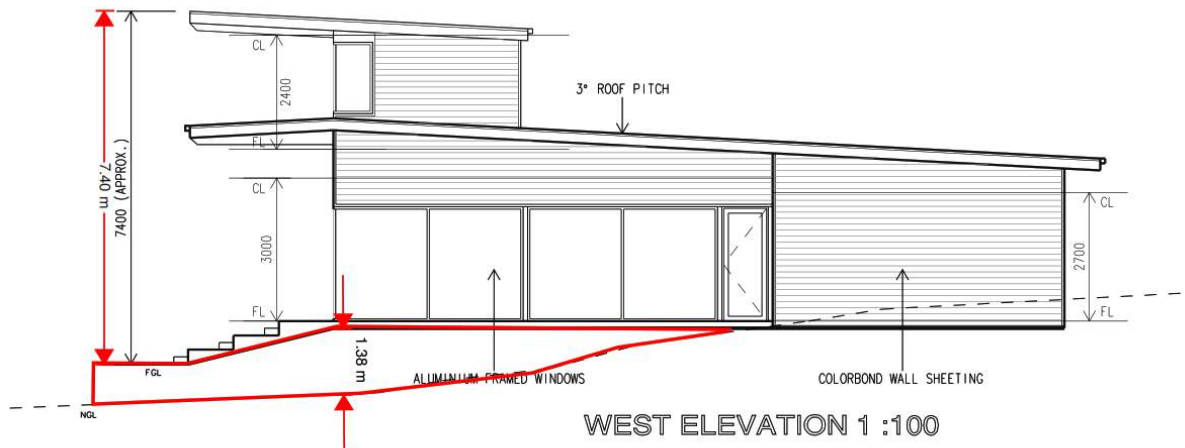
assessment officer markup of west elevation of clubhouse retaining structures above natural ground level (highest point approx. 1.38m)
